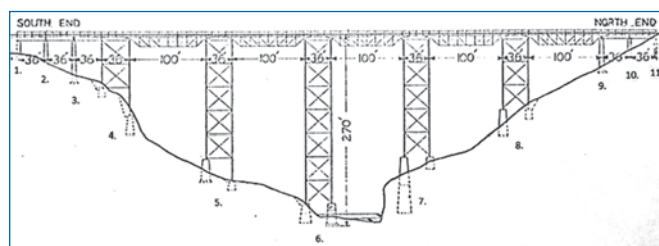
Schematic diagram of bridge structure underneath the cross-section of the bridge.
